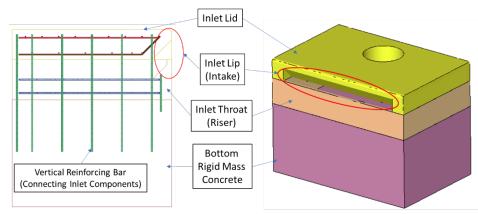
Finite Element Monolithic Inlet Model Components.
